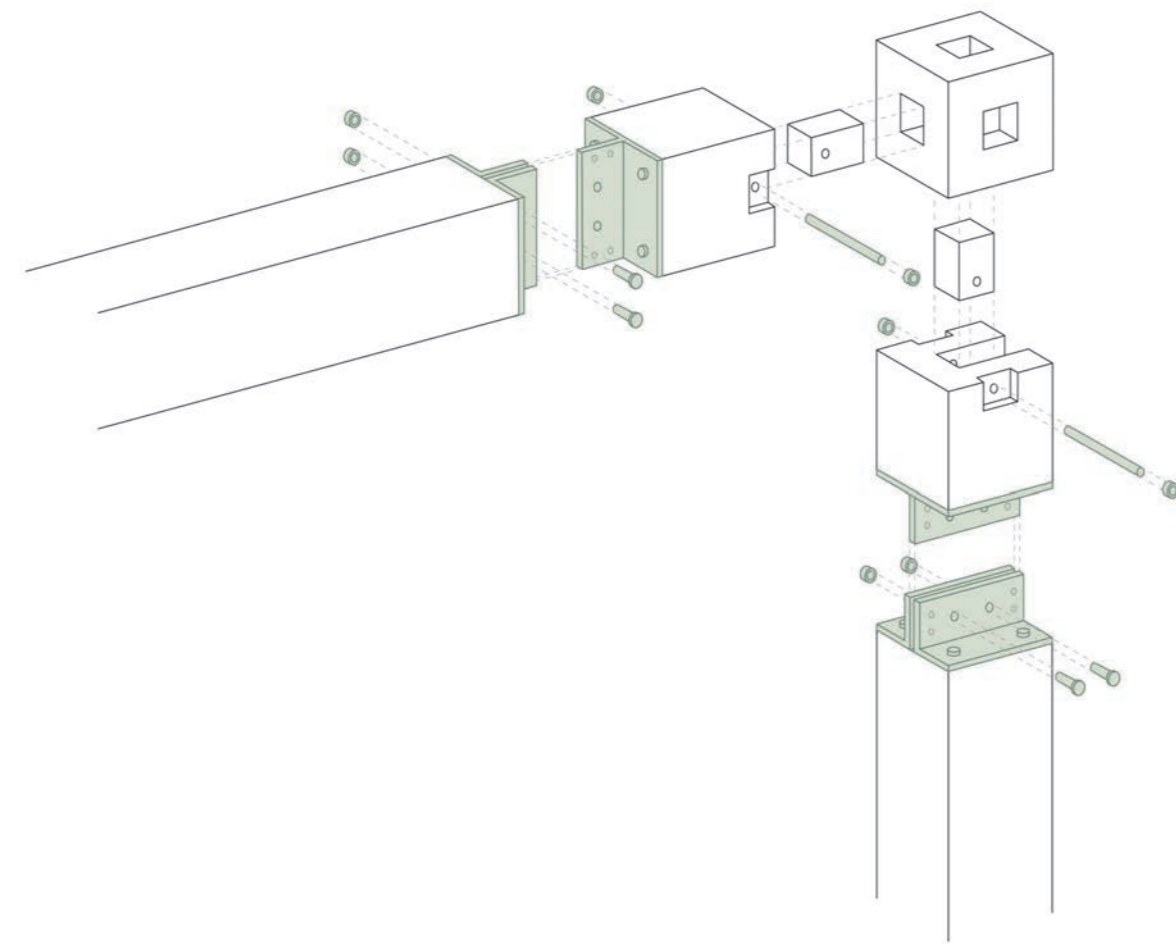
By author, Exploded axonometry adaptable structural system
